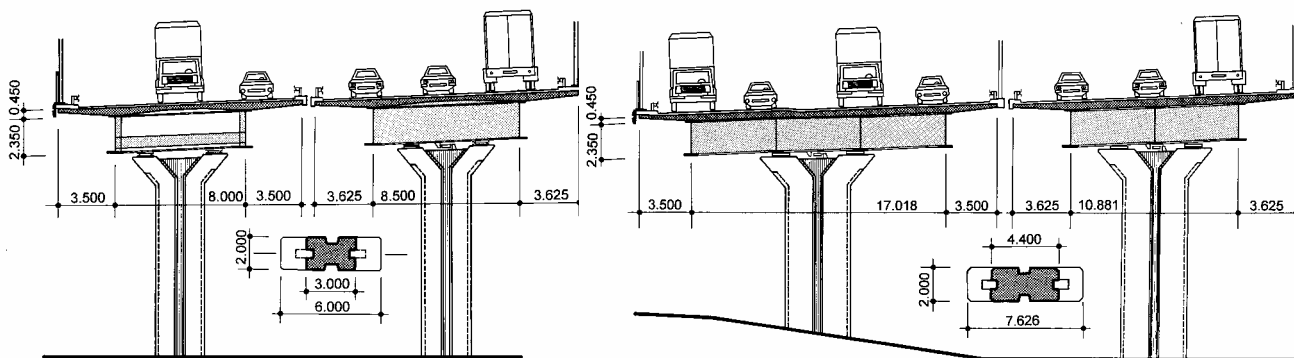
Bridge Rudna – typical cross section. Fig.16 Bridge Rudna – cross section at widening.
